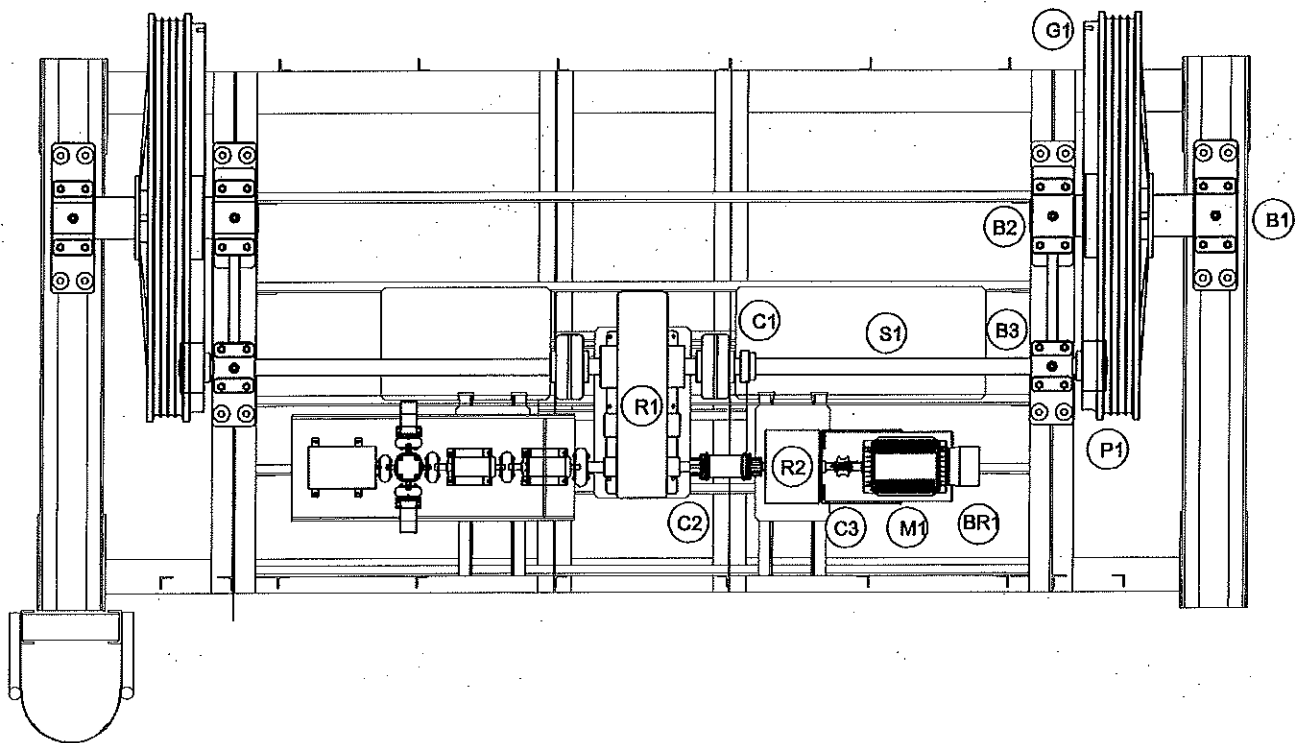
Drive Machinery Layout – North Tower shown (South Tower opposite hand)
